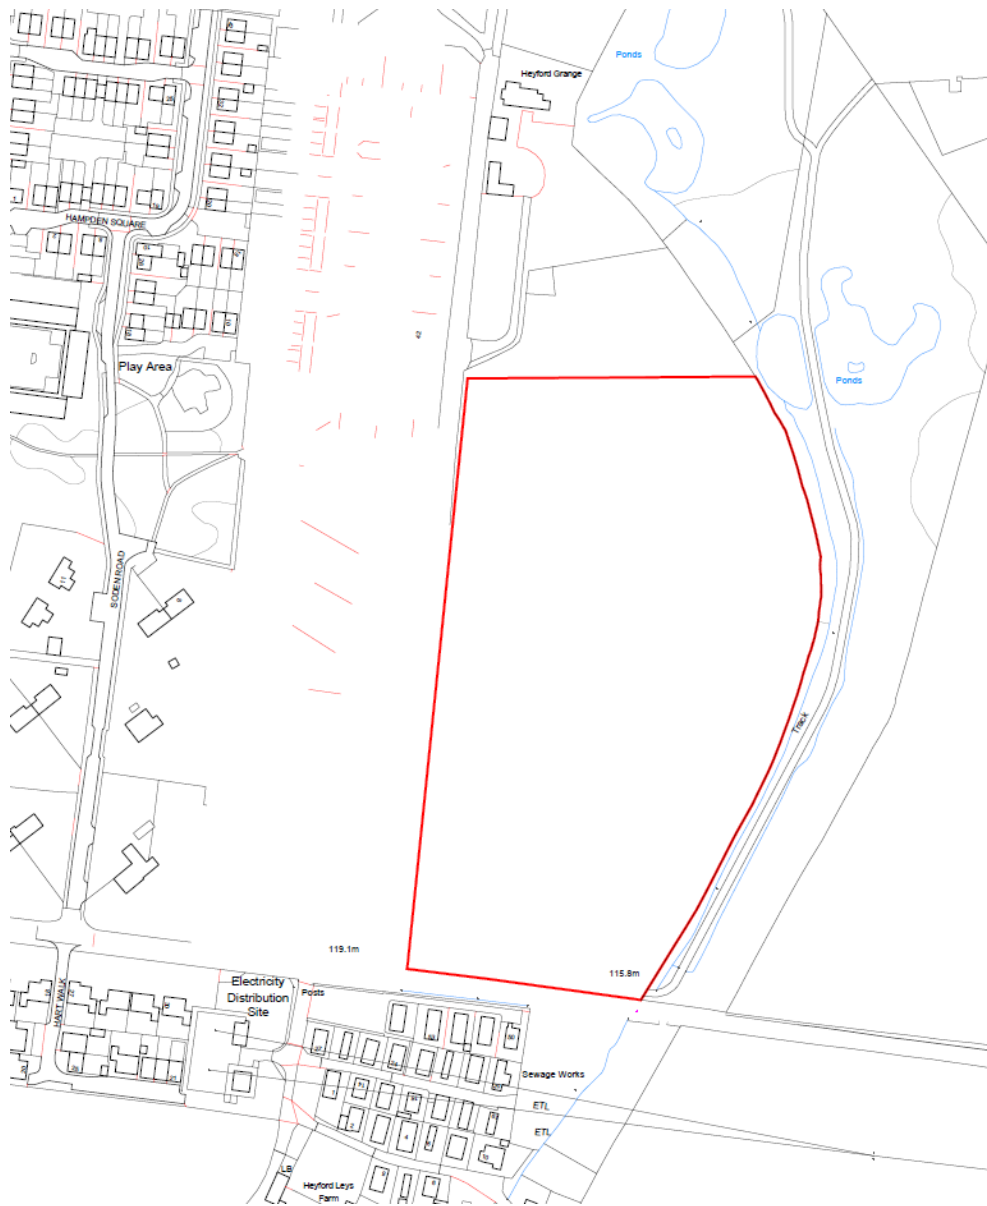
Application Ref. 22/03063/F – Site Location Plan
